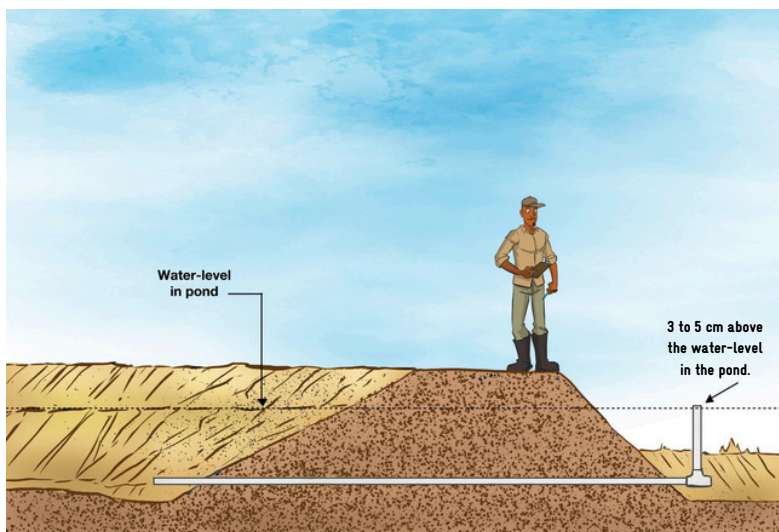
Cross-section of the pond dyke showing that the outlet pipe should be 3 to 5 cm above the water-level in the pond.
